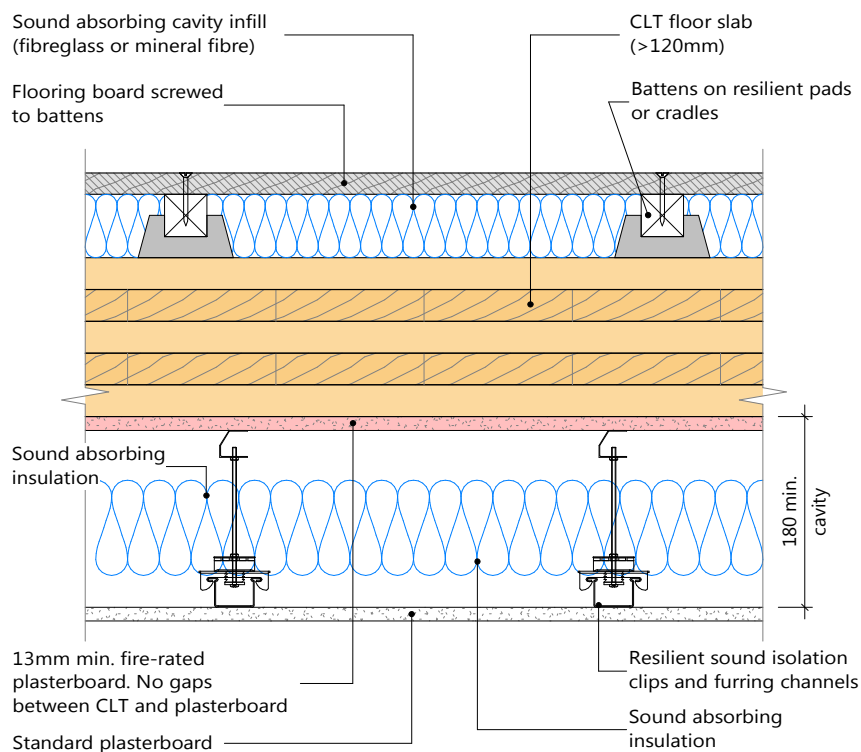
A generic lightweight floating floor system on CLT. Additional fire rating of the CLT floor is achieved by direct fixing fire-rated plasterboard to CLT underside.
